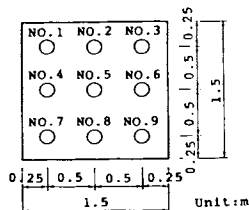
Configuration of piles (No.5 pile is used in the static loading test, No.1,3,7,9 piles are used to the reaction frame in the static loading test)
